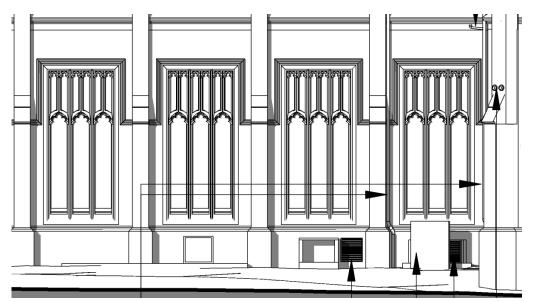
Detail from proposed front elevation of college building. Note enlarged ventilation wall louvre, replaced plant unit and enclosure, and removed window (with opening infilled and new ventilation louvre added).
